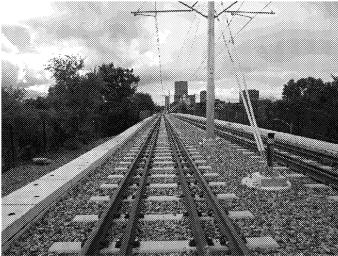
(left): start of Jordan rail protection west bound into Bay View station.
